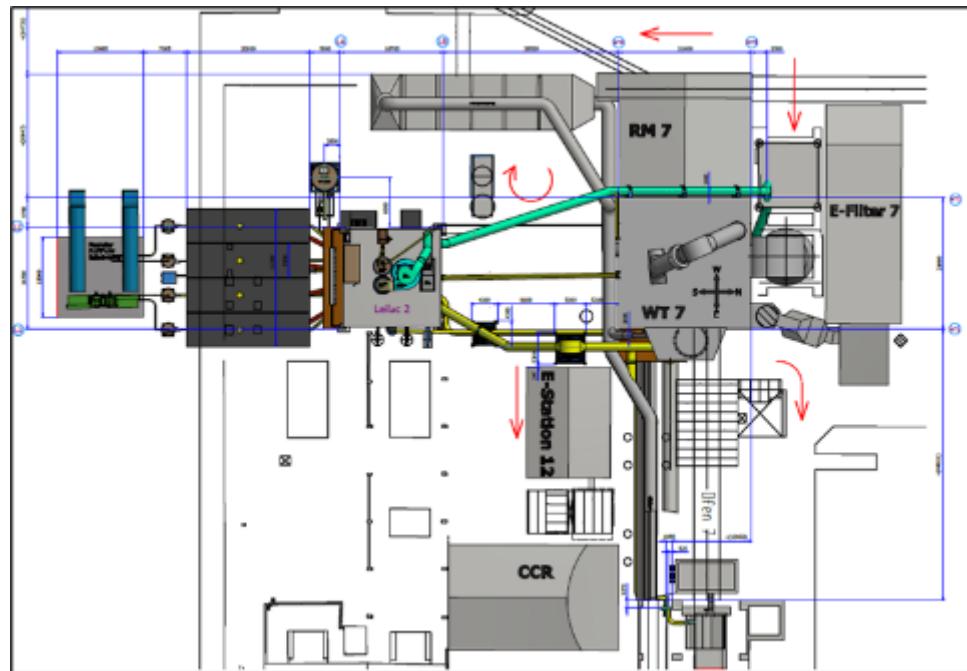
Hannover site layout, with Leilac-2 and its tie-ins shown. The layout is facing West.
